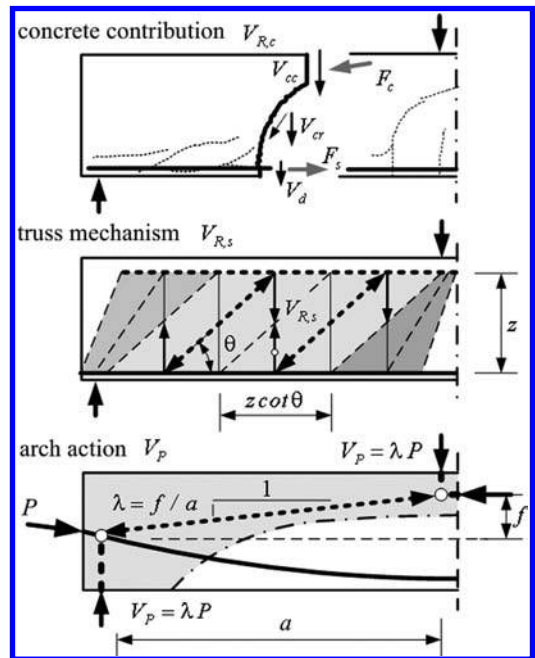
Shear mechanisms of members with or without shear reinforcement.
